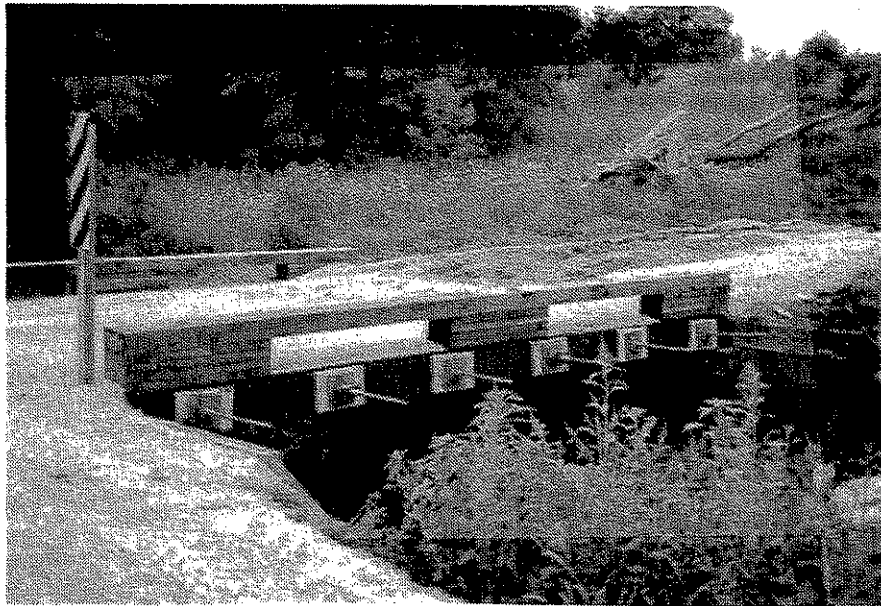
Cottonwood deck system - typical 24 ft stress-laminated deck.
